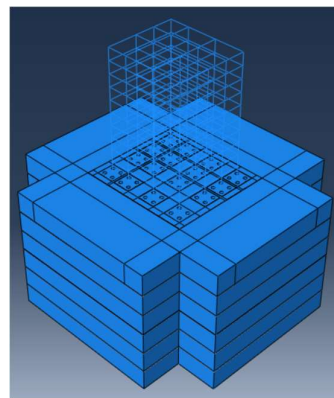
Isometric view of the model used for building without irregularity on plane ground with pile foundation
